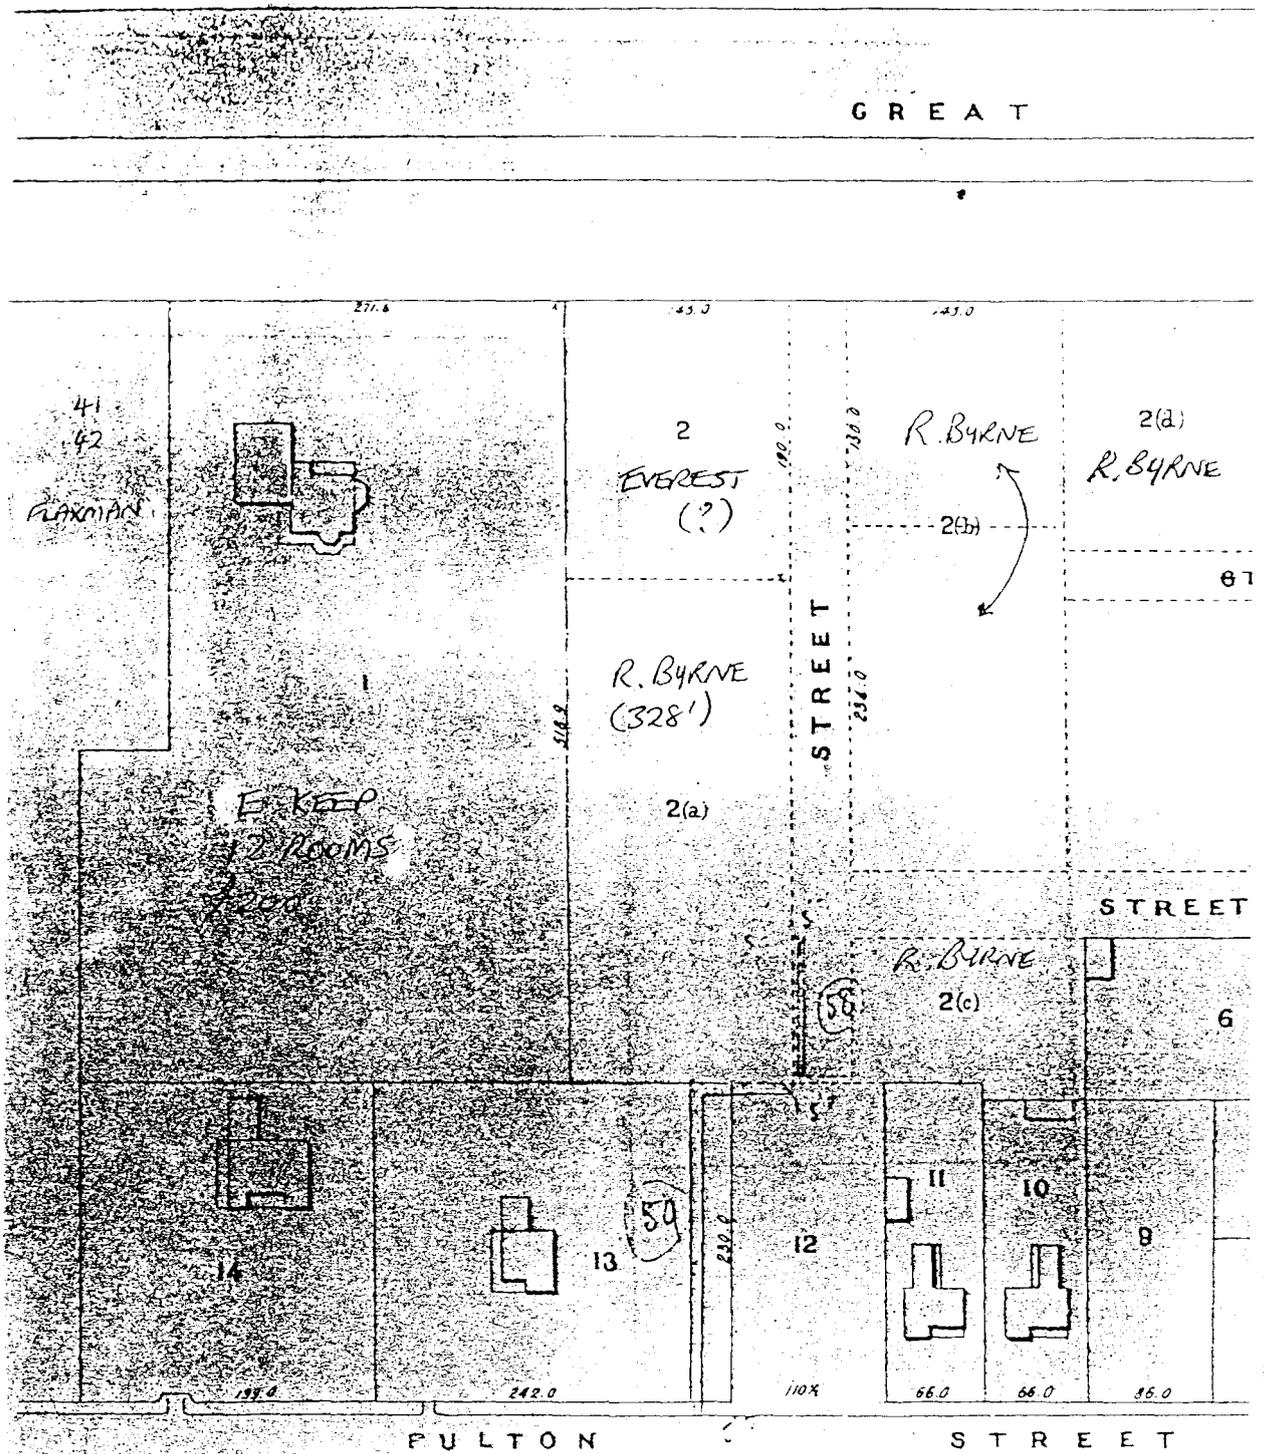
1873 site plan showing the original 1864 house. Reproduced from 'Plan of the Borough of St Kilda', J E S Vardy, 1873 (La Trobe Library Map Room).
